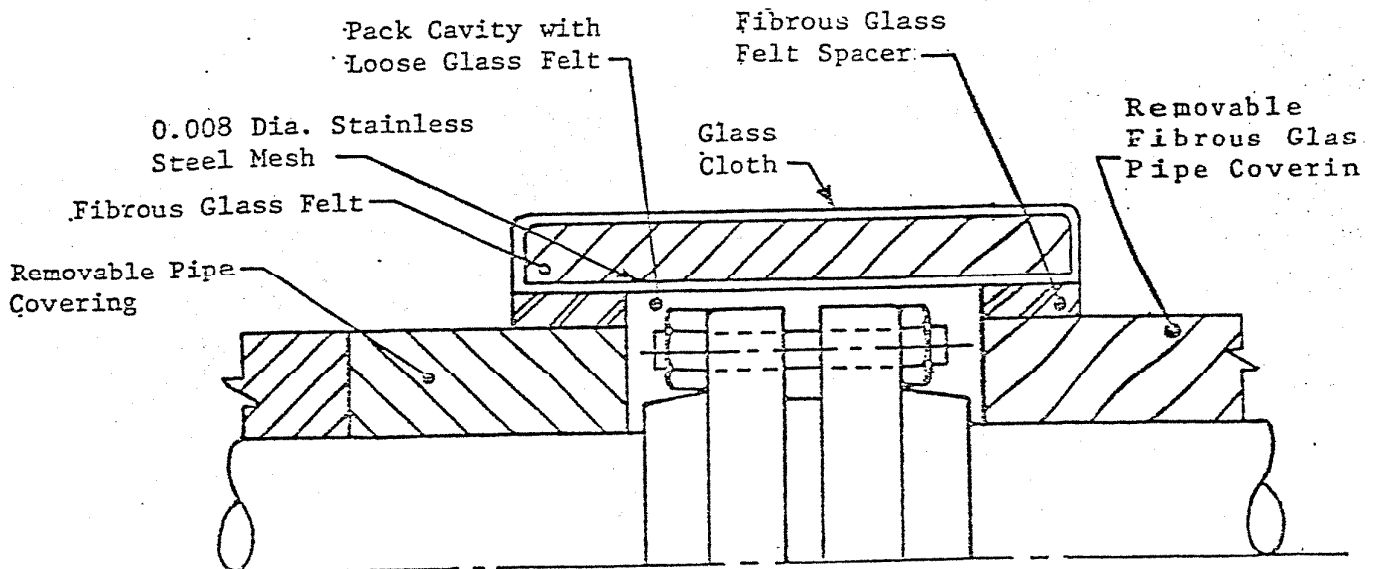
Removable Pipe Covering Requiring Glass Felt Spacer
